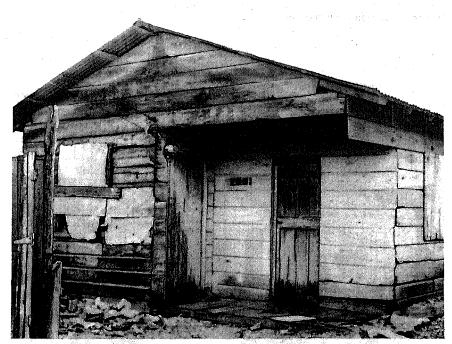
A house without a foundation is not adequately built. This house rests directly on the ground and the wooden siding is beginning to rot. Mark it inadequate original construction.
